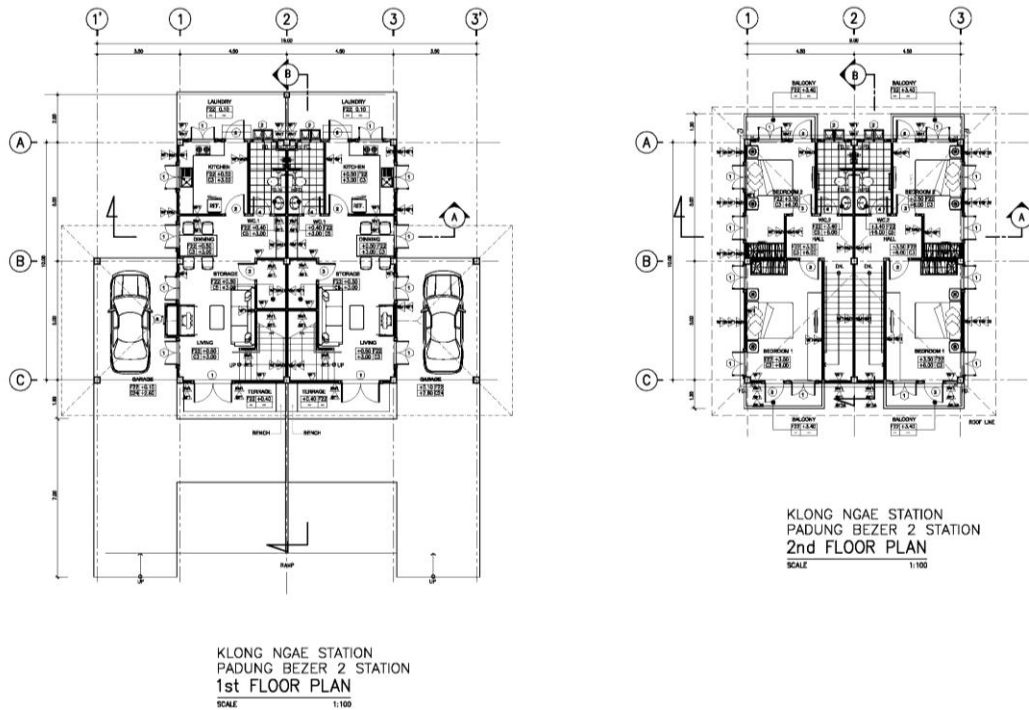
The Staff Lodge Type-A Plan at Khlong Ngae Station
